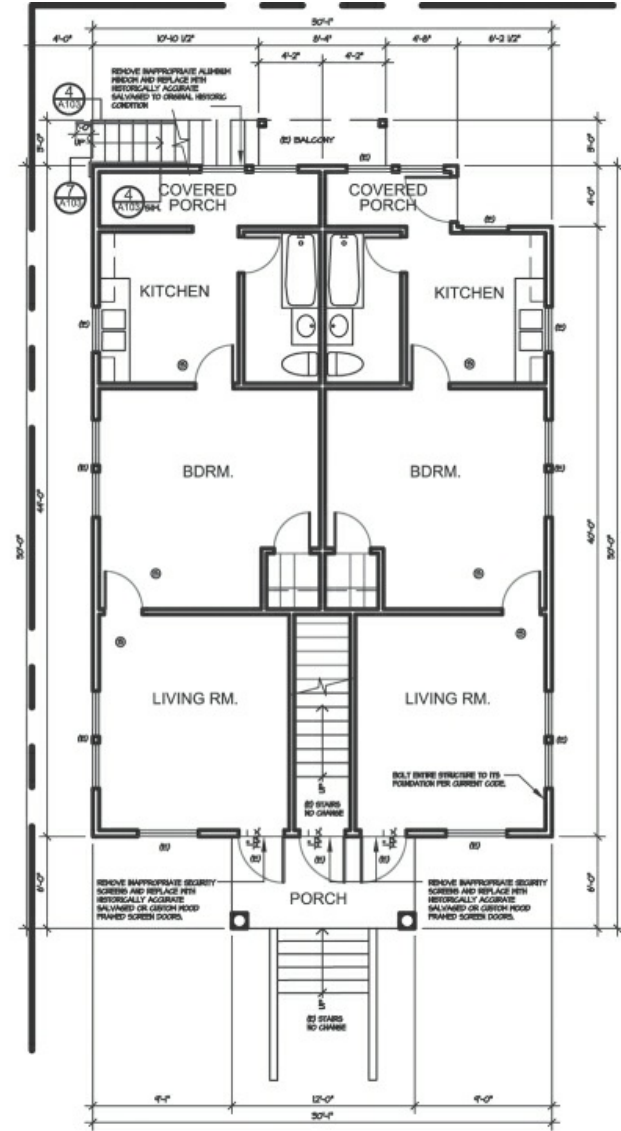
Vista del Largo: Split floor plan with key plan.
